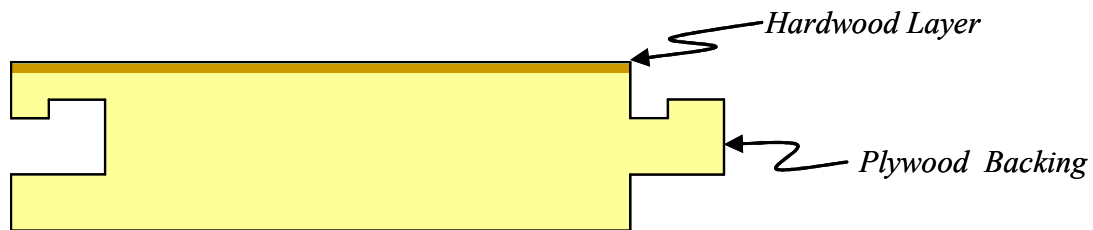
(b): Engineered floor plank construction consisting of a thin layer of hardwood over a plywood backing.
